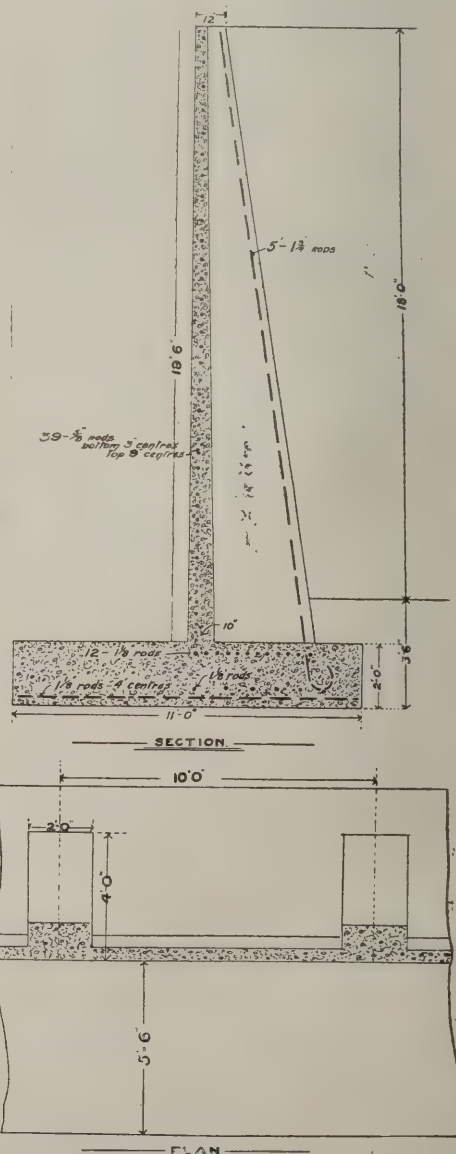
REINFORCED CONCRETE RETAINING WALL, AMERICAN DESIGN.
